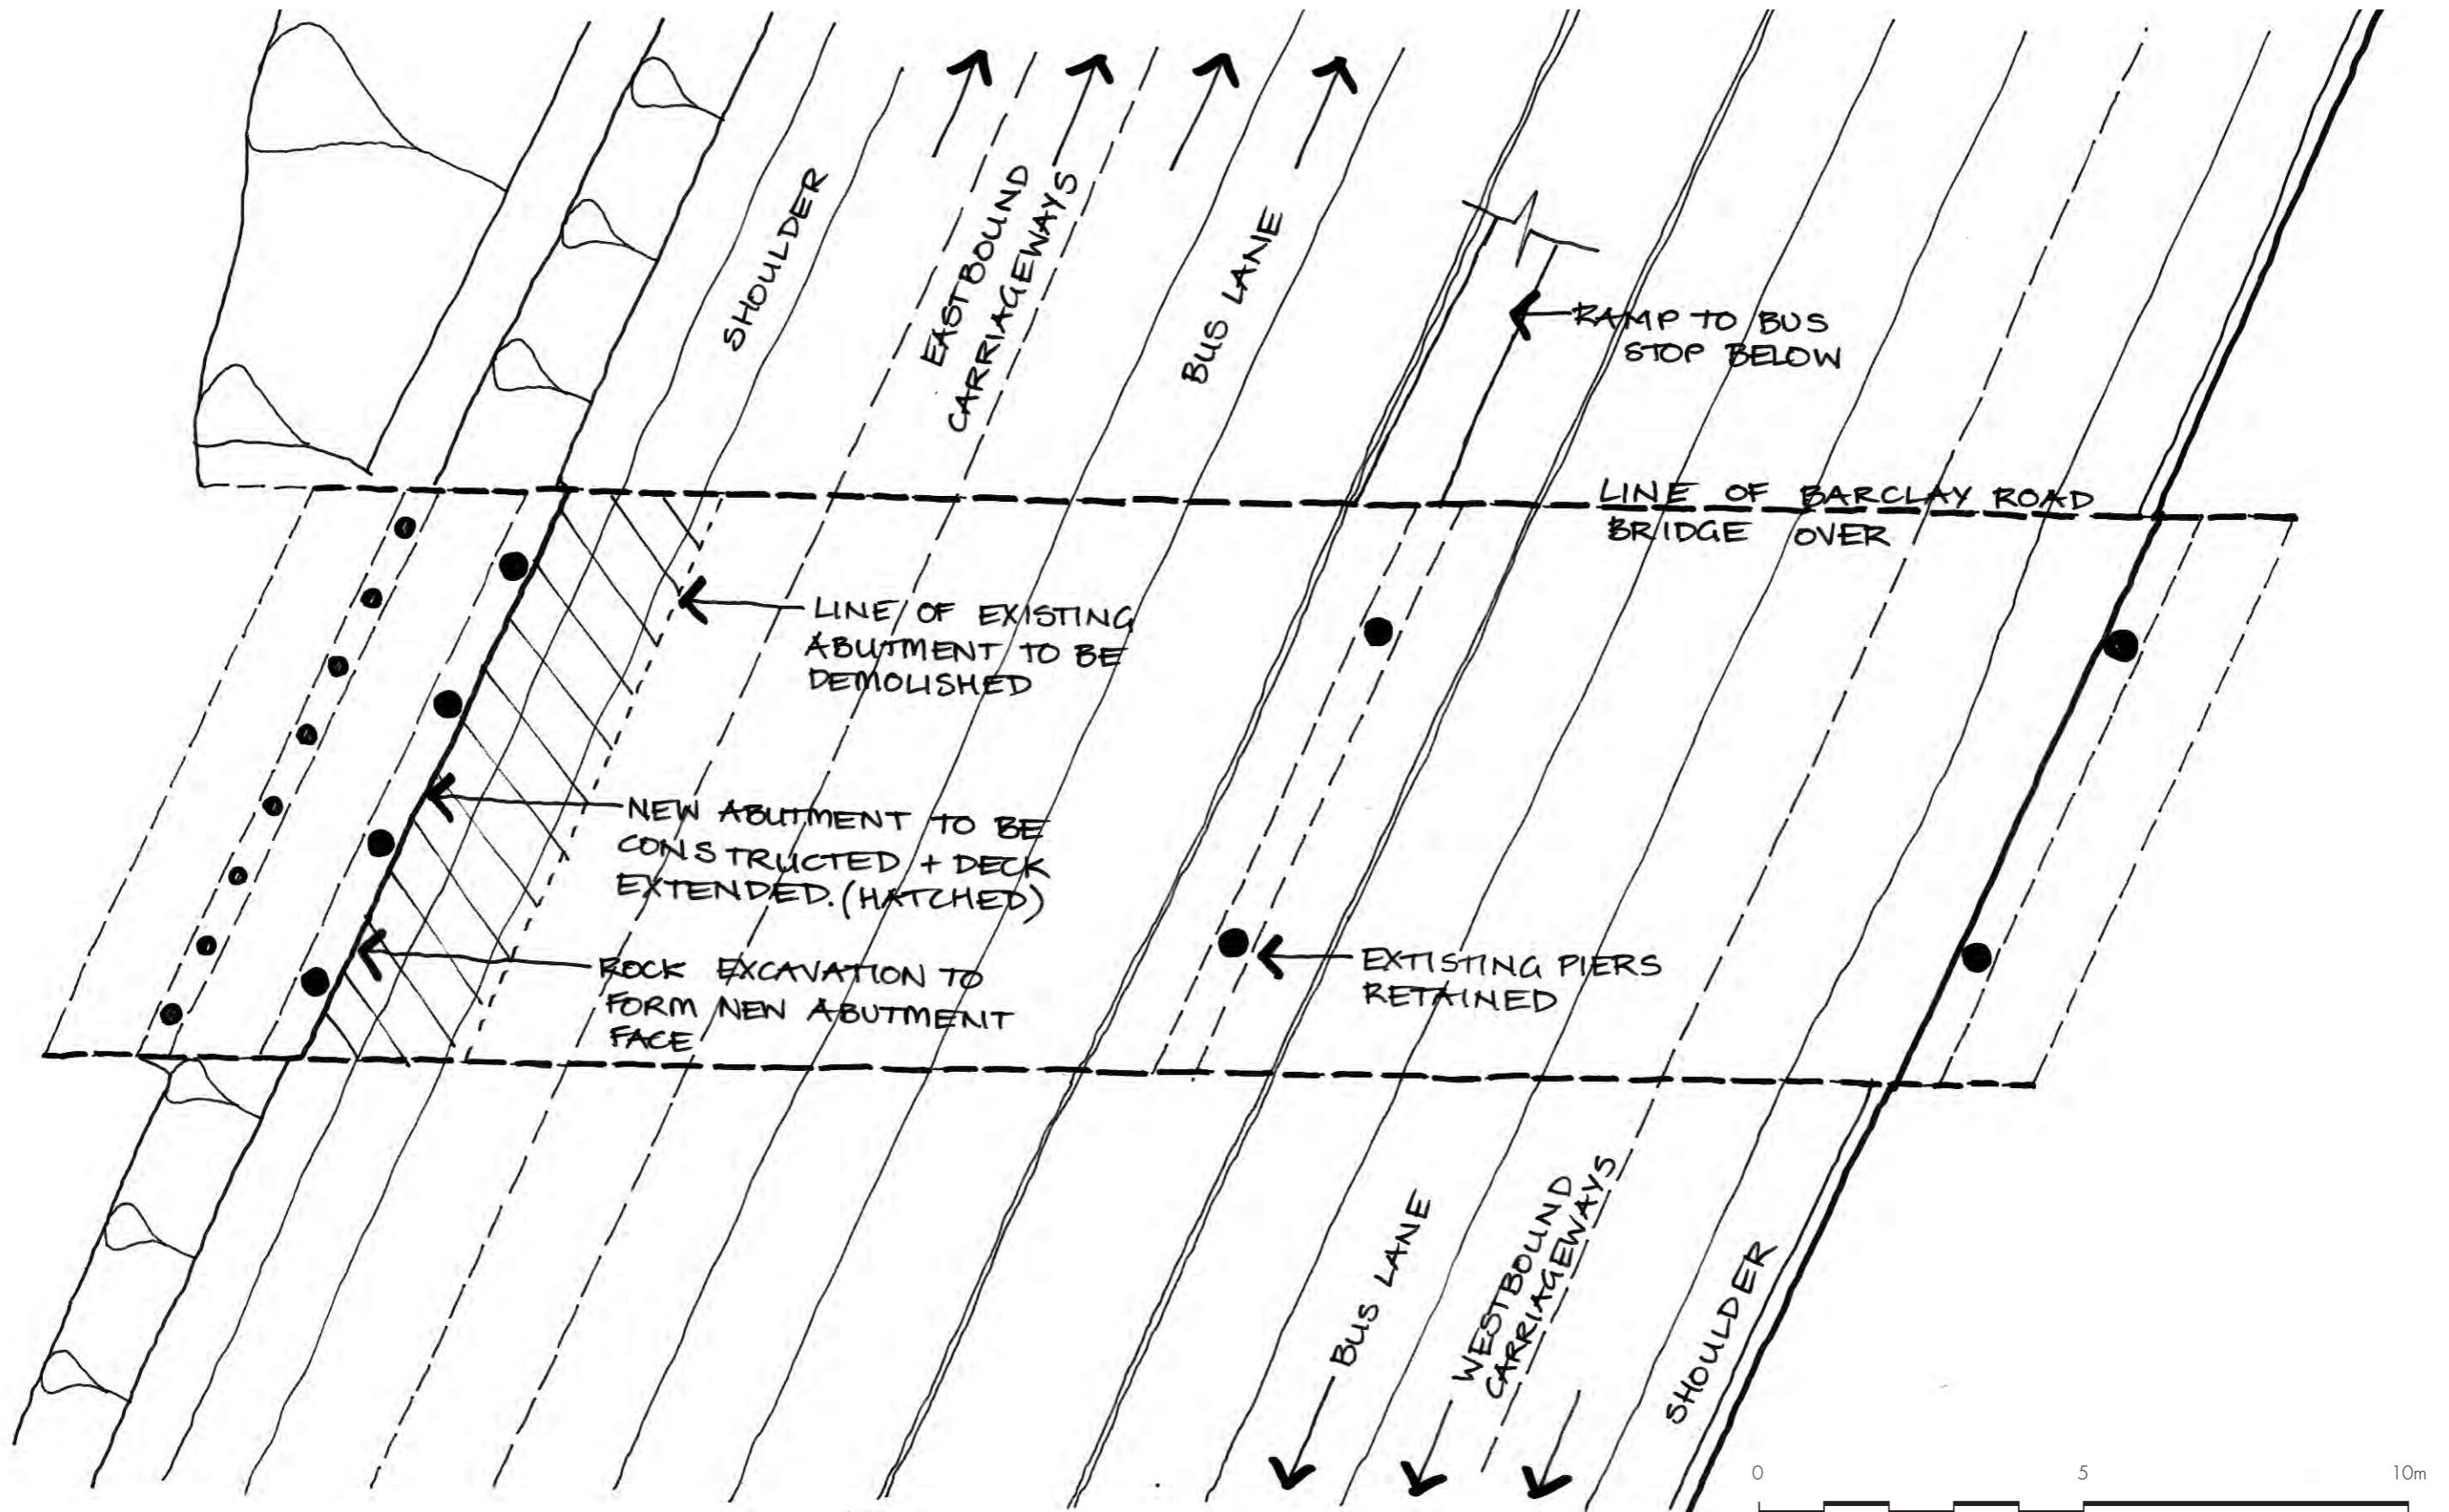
Bridge 2.2 Barclay Road Overbridge - Plan
